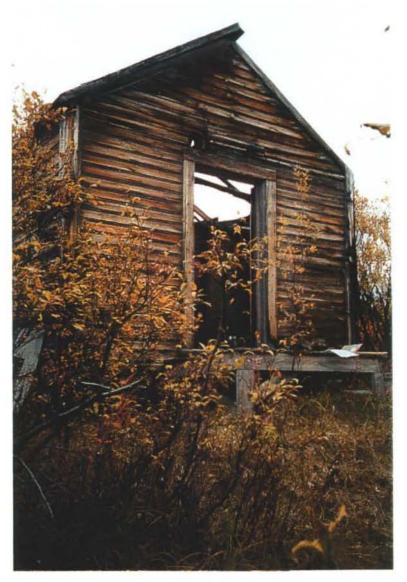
Partially collapsed building (Bldg. 21-C). (Azimuth 160°)
